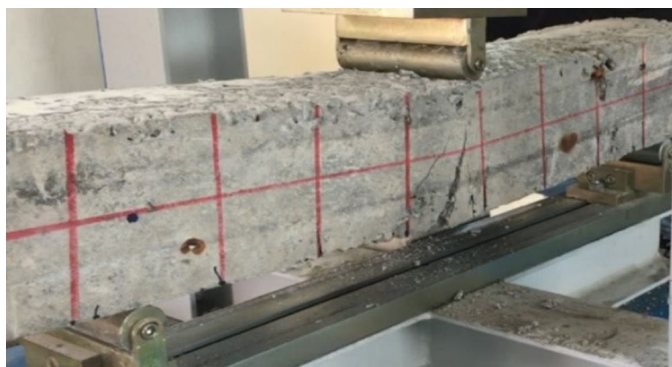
Normal reinforced concrete beam’s crack pattern
